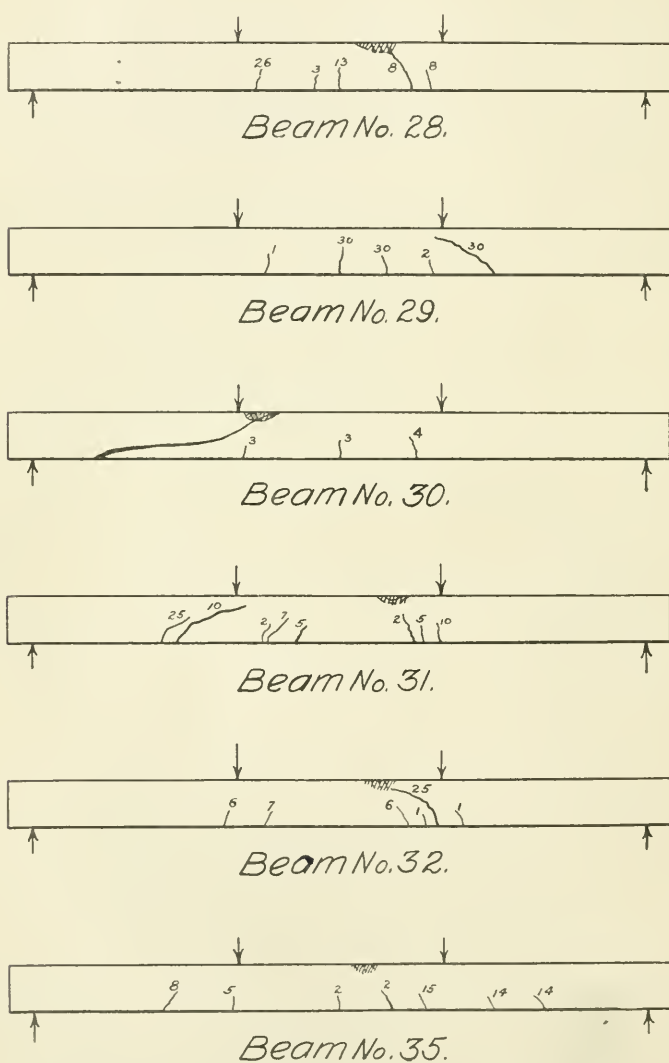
SKETCHES SHOWING BEAMS AFTER FAILURE UNDER REPETITIVE LOADING.
